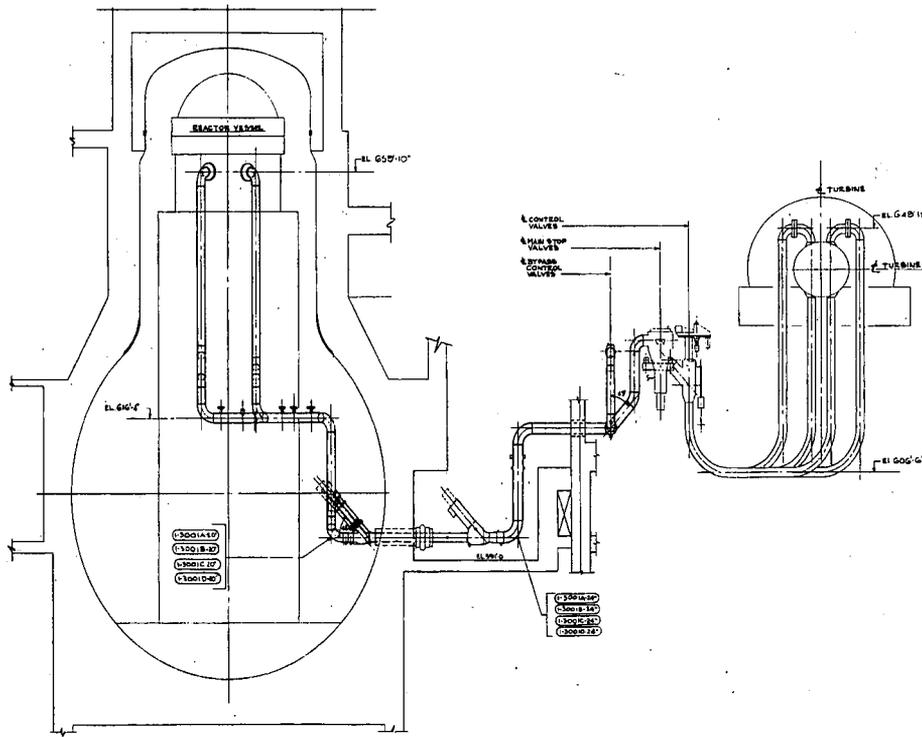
Typical Main Steam Line Layout Between RPV and Turbine (elevation view)
